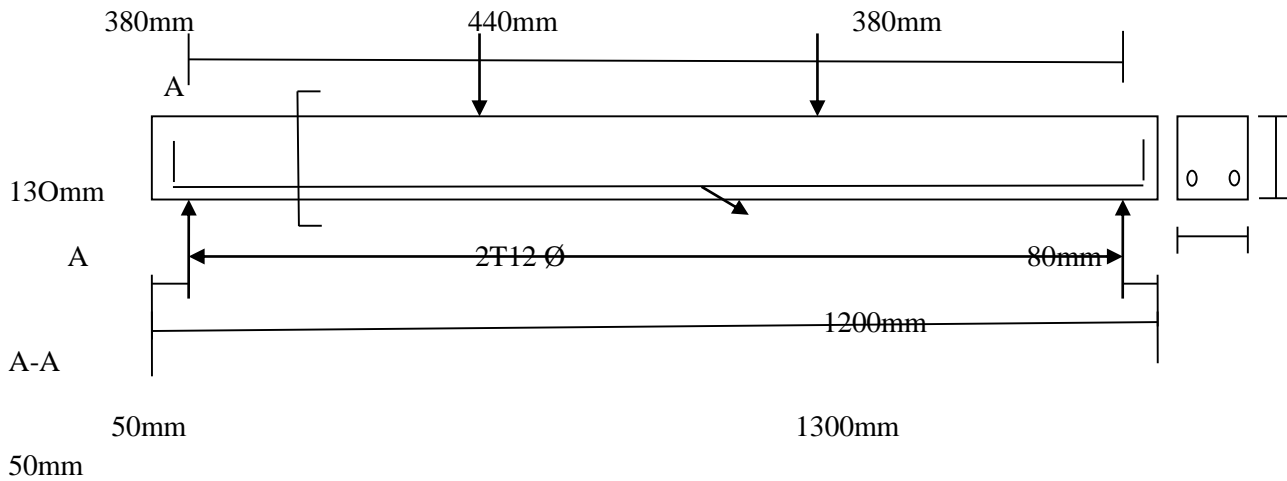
beam 2 - beam without links and good anchorage of longitudinal reinforcement.
